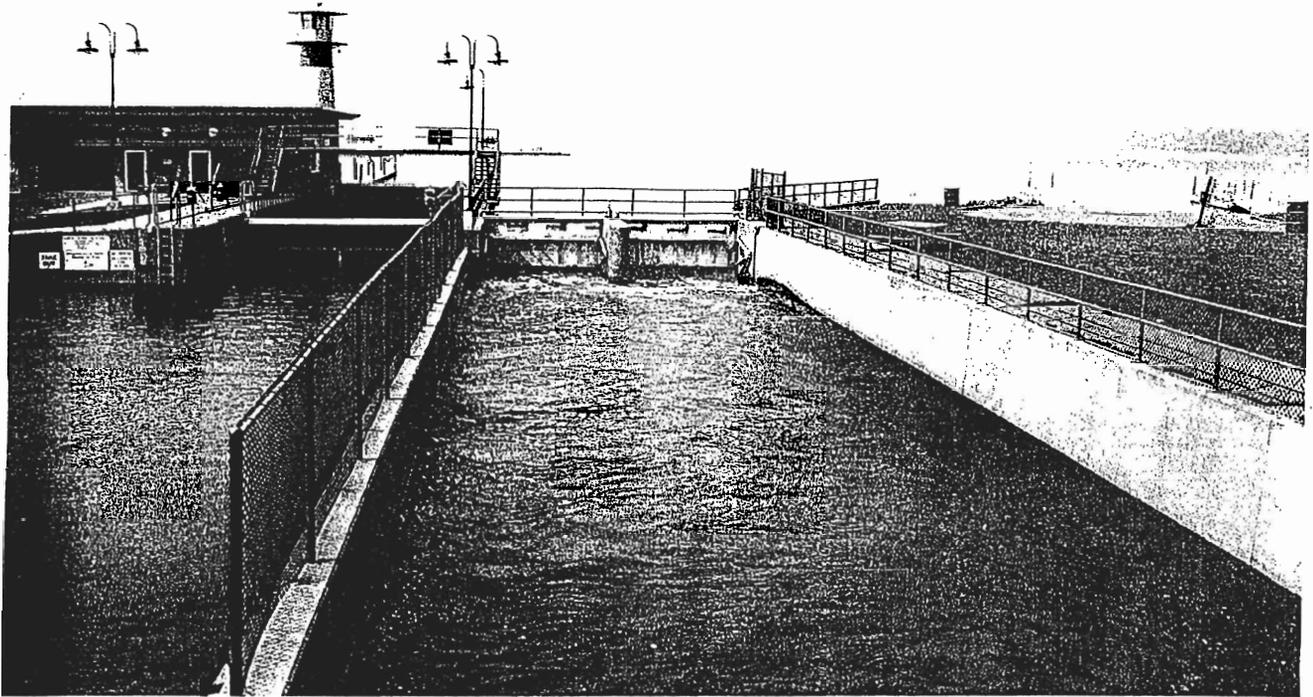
View of dam from downstream. Two tainter gates on right of wall and lock on left
